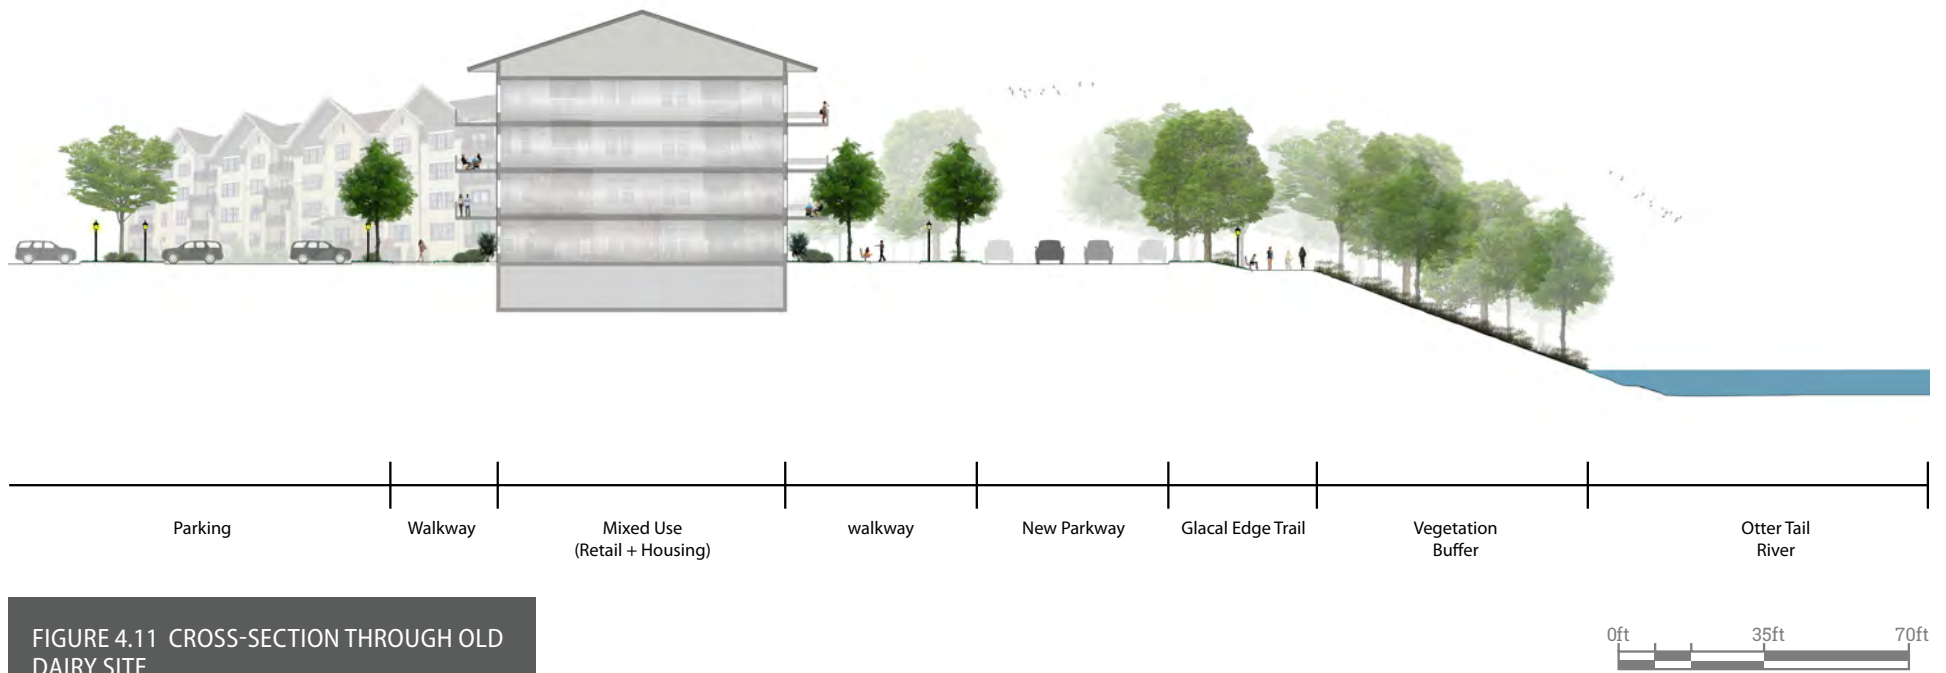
CROSS-SECTION THROUGH OLD DAIRY SITE
